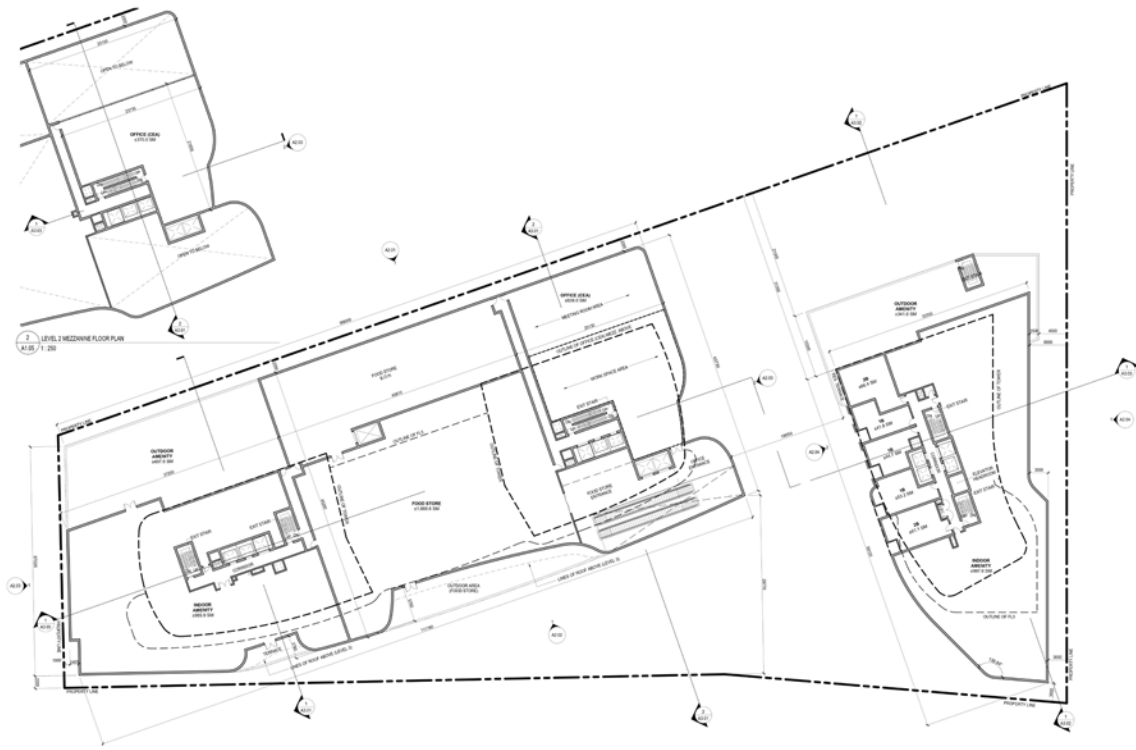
Second Floor and Second Mezzanine Floor Plan (Prepared by Giannone Petricone Associates Architects)
